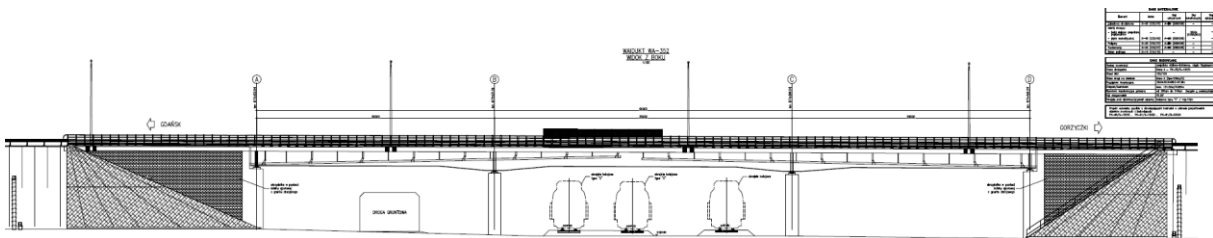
Precobeam Bridge, Highway D1 object WA352 Case E1. Transversal view
